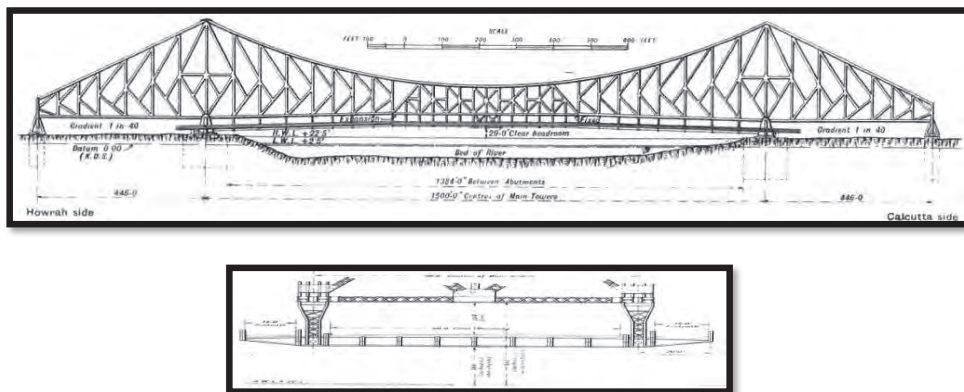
Side elevation and cross-section of Balanced cantilever steel truss bridge Howrah Bridge put up by Messrs Rendel Palmer Tritton (picture adopted from *The Engineer*, February 7th, pp. 152, 1930, Graces Guide UK).
